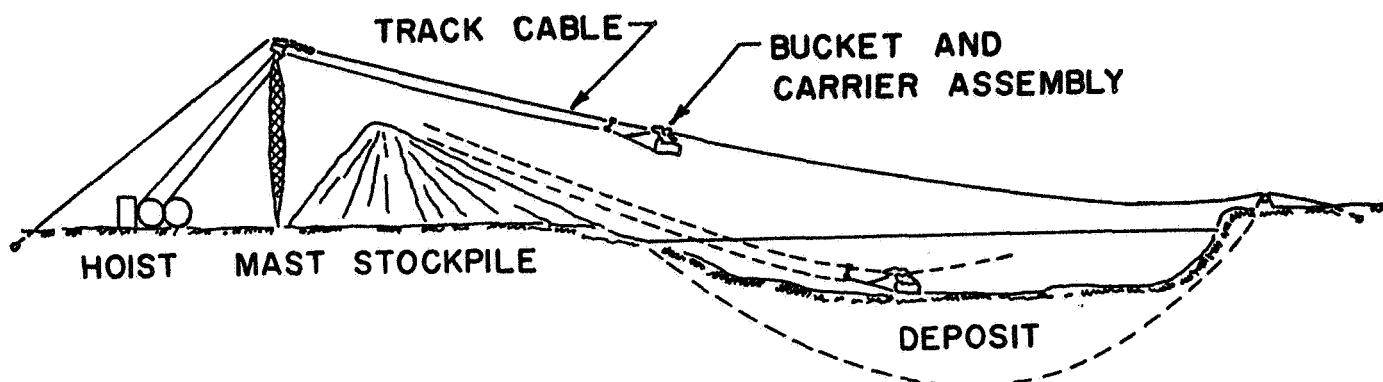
Cable excavator system as illustrated by a manufacturer (Ref. 42).
